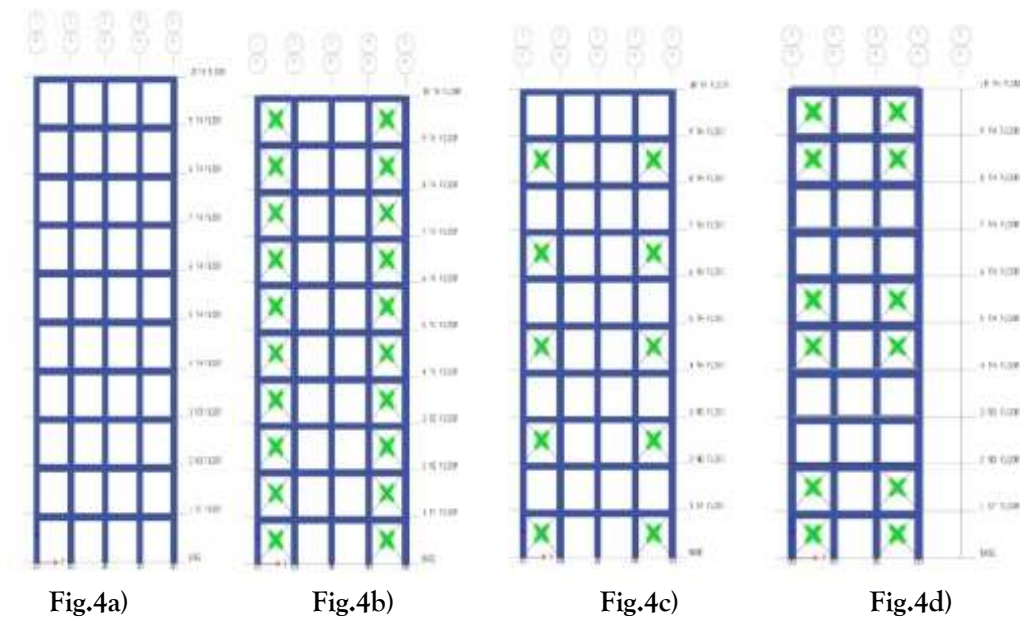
Symmetrical and Unsymmetrical building of 10, 15,20 story damper placement a) Without damper b) All floor damper c) Alternate floor damper d) Top, Middle, Bottom damper
